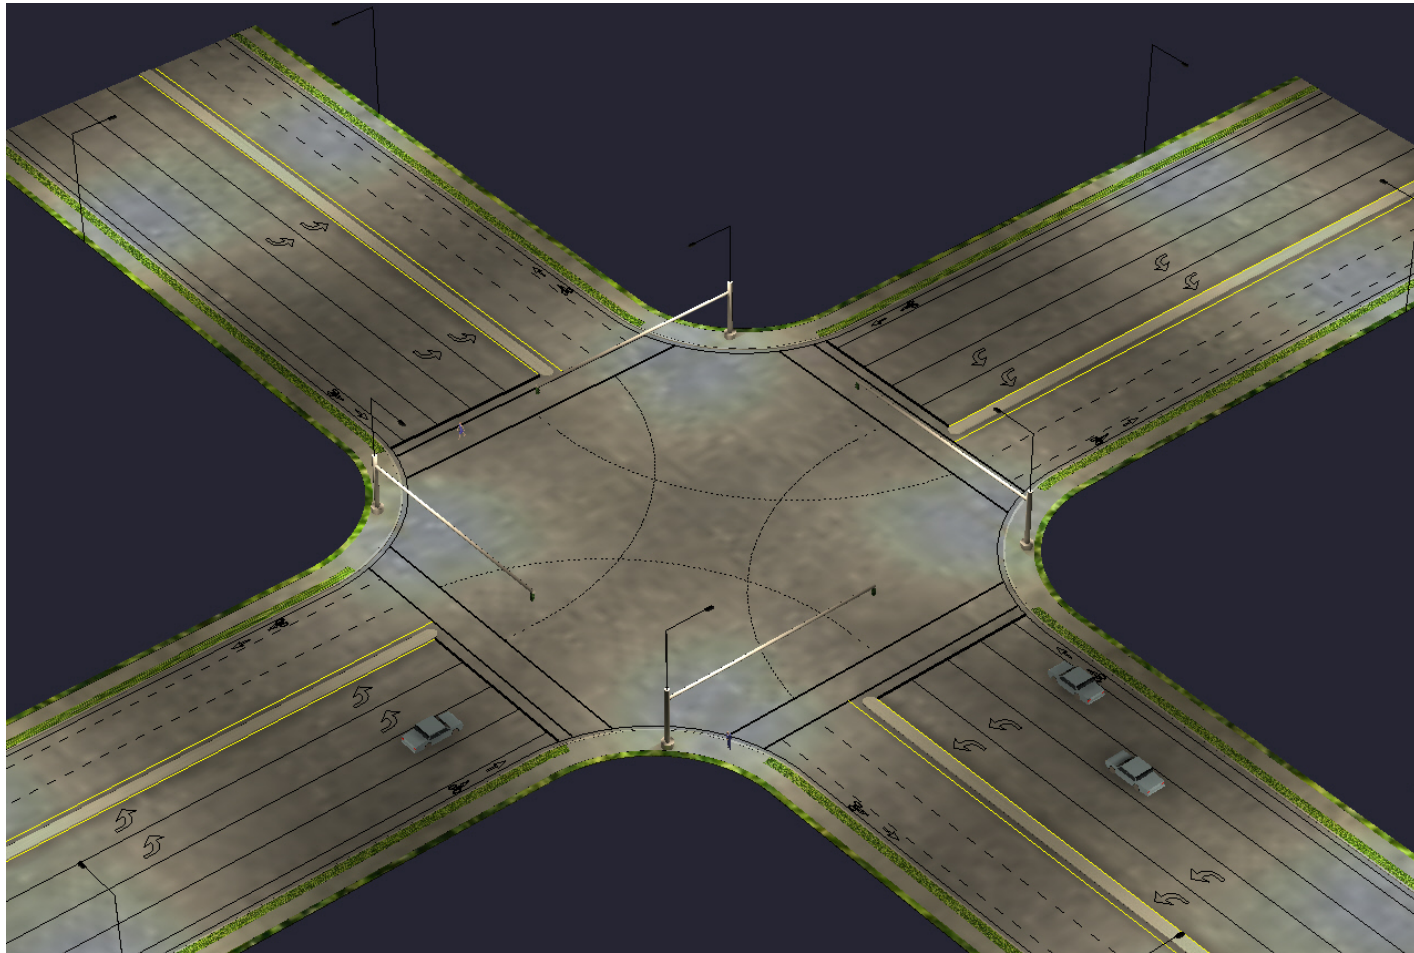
Typical Lighting Layout for Large Intersection
